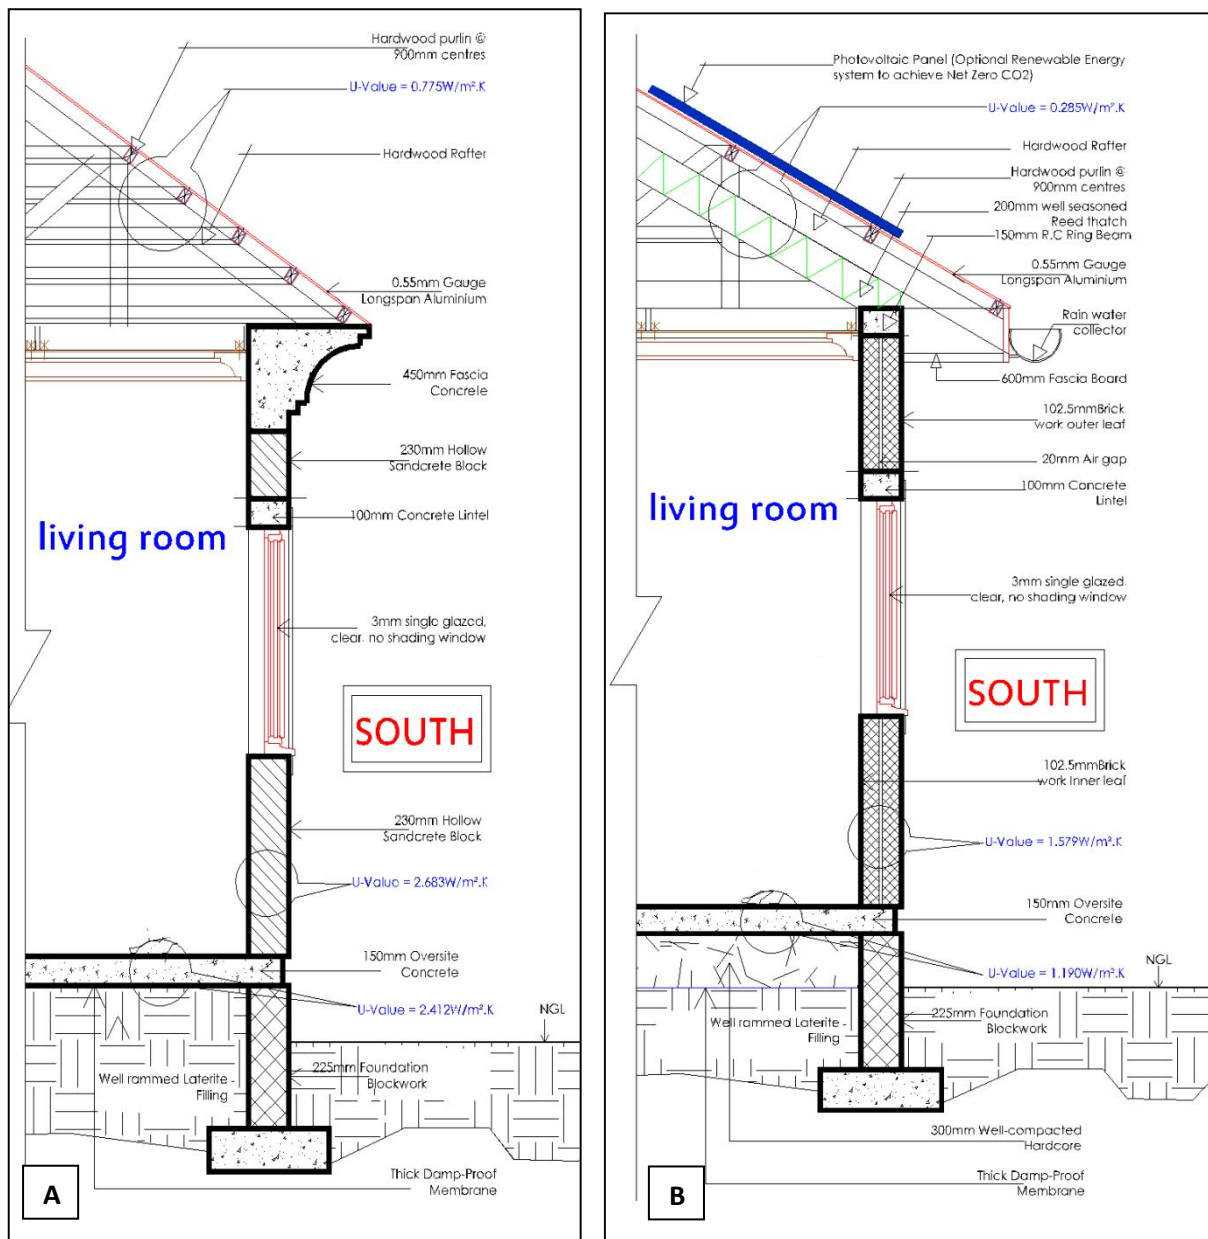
Sectional views showing the As-Built Construction Method (A) and Proposed optimized Construction Guideline (B)
